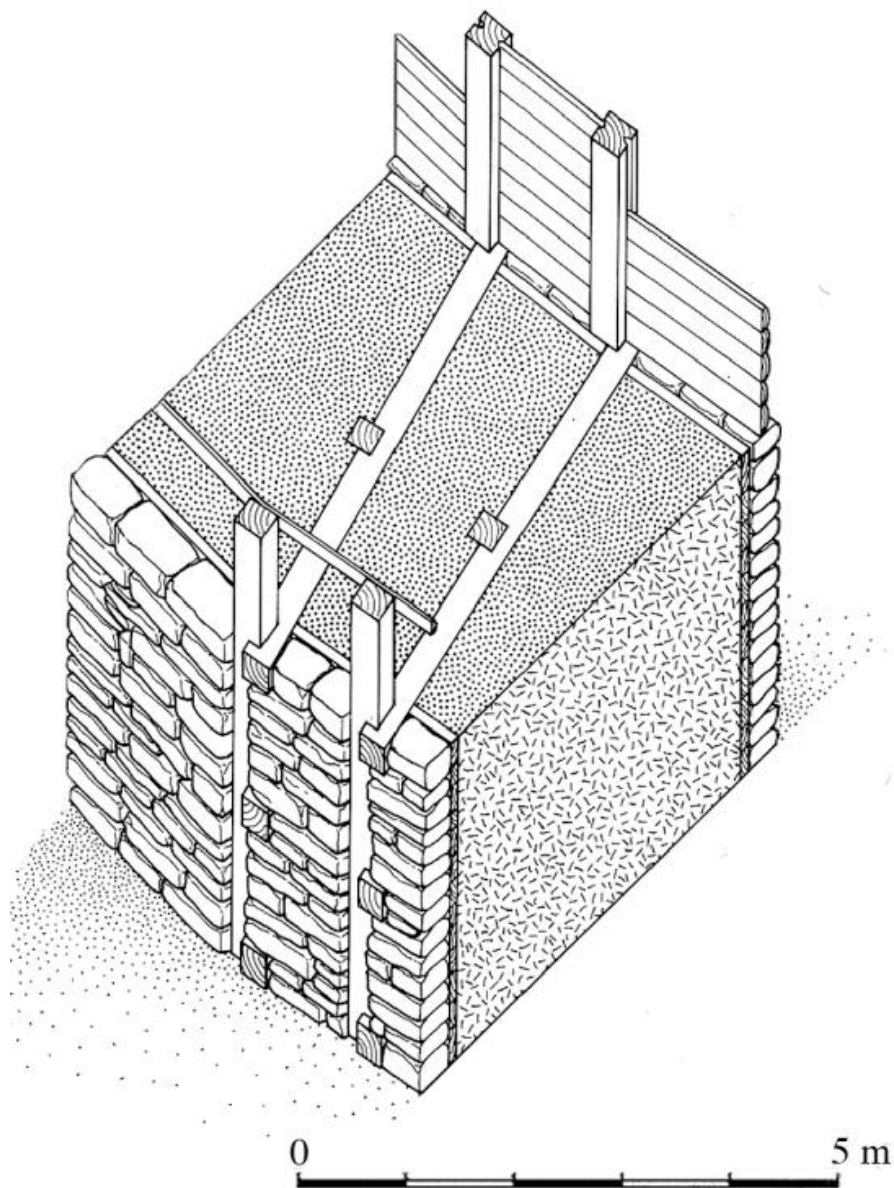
Heuneburg: Isometric reconstruction of a wall section (construction phase Ia/4), the façade featuring a wooden plank wall veneered with dry stone masonry (modified after Gersbach 1996, 45 Fig. 31).
